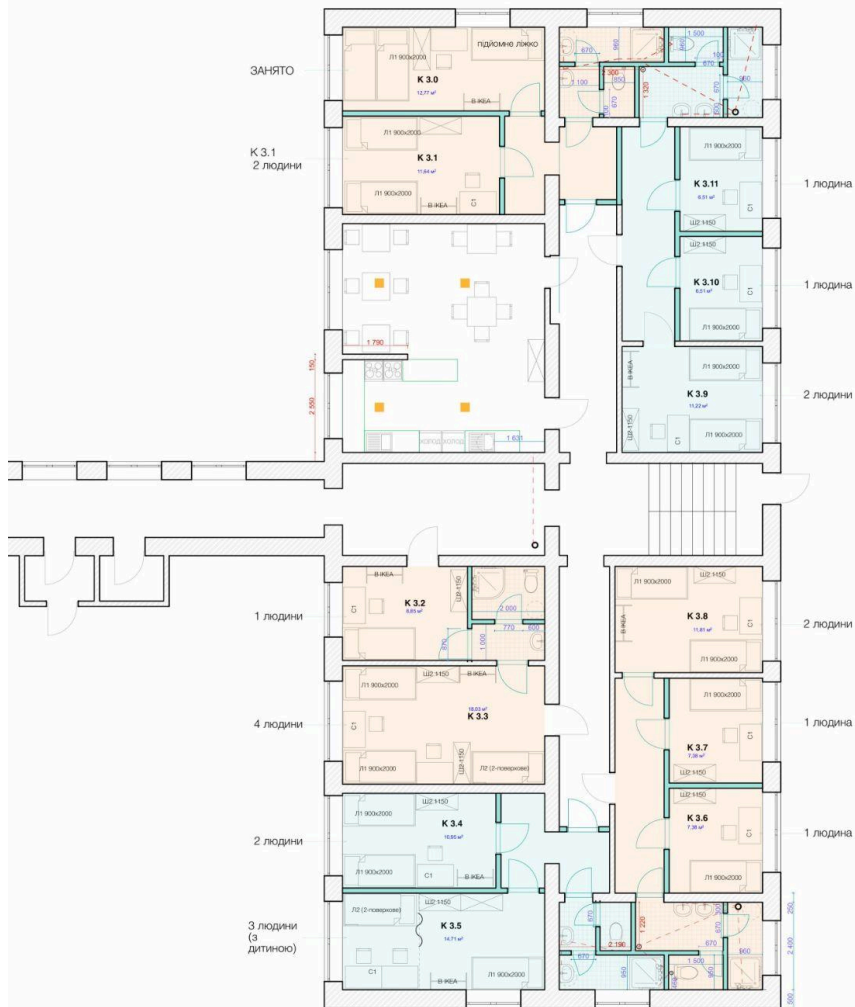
Sadok – Section 3, 1st Floor Plan
